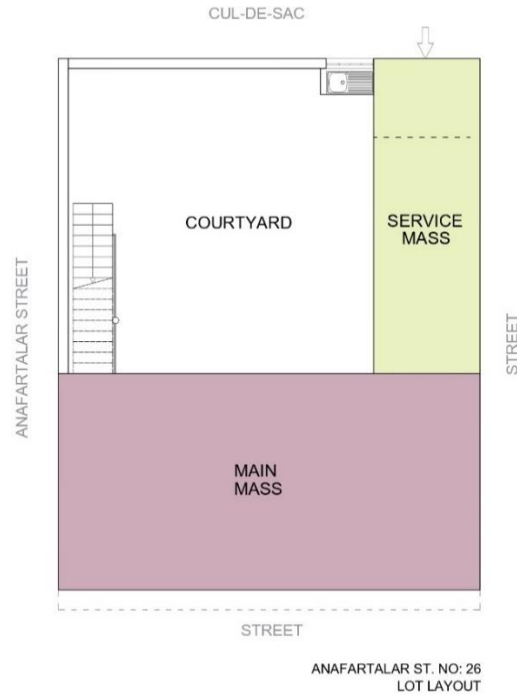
Lot layout of Anafartalar-26 house (Author, 2023)
